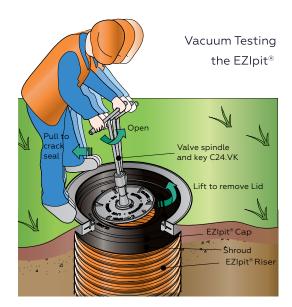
Removing the EZIpit® Lid from the Cap for Sewer Inspection or Vacuum Testing.
